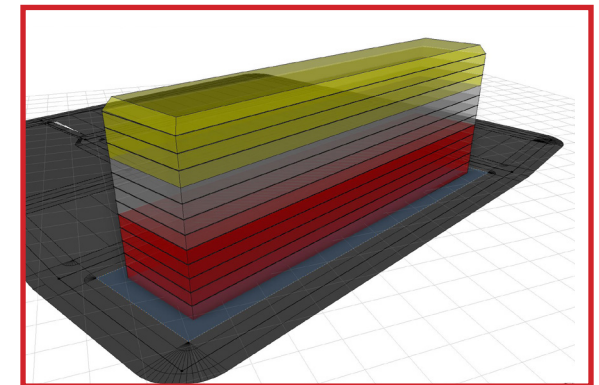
The building envelope depicts 5 floors of commercial use, 4 floors of office use, and 4 floors of residential use
